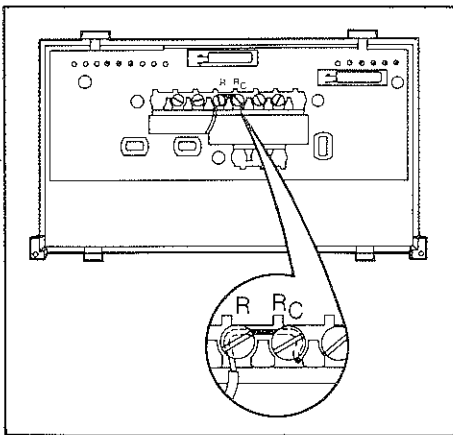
Jumper RC and R for single transformer system. Strip wire 19 mm [3/4 in.].
